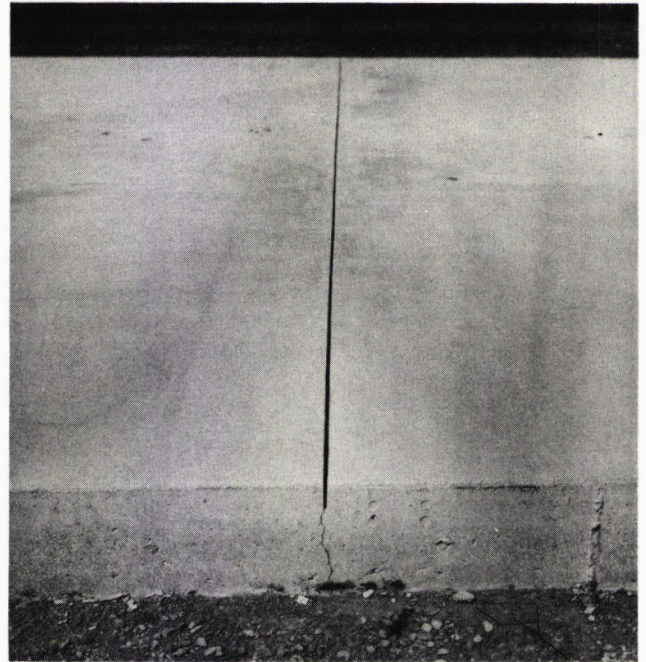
Typical sawed contraction joint between short slabs, before sealing.
